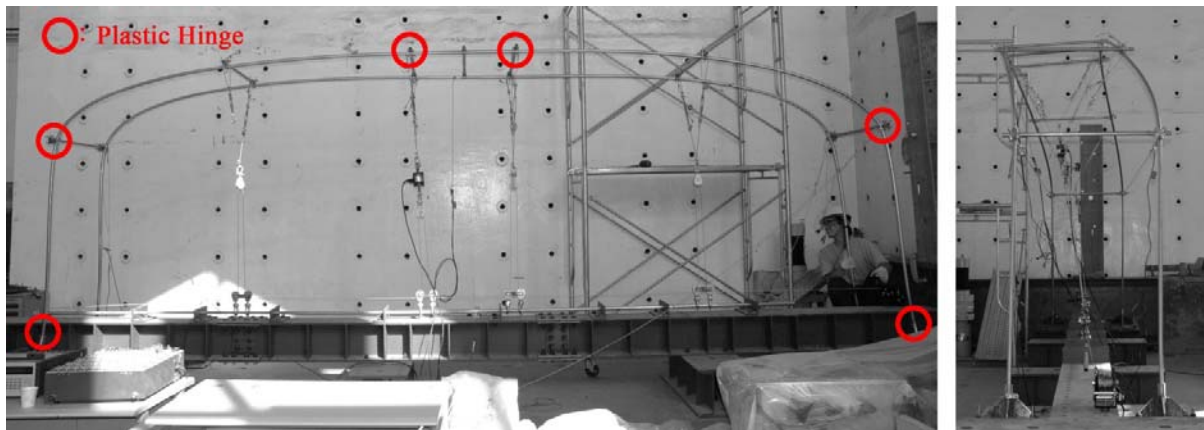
Failure Mode (left: unstrengthened frame; right: strengthened frame with tension ties)
